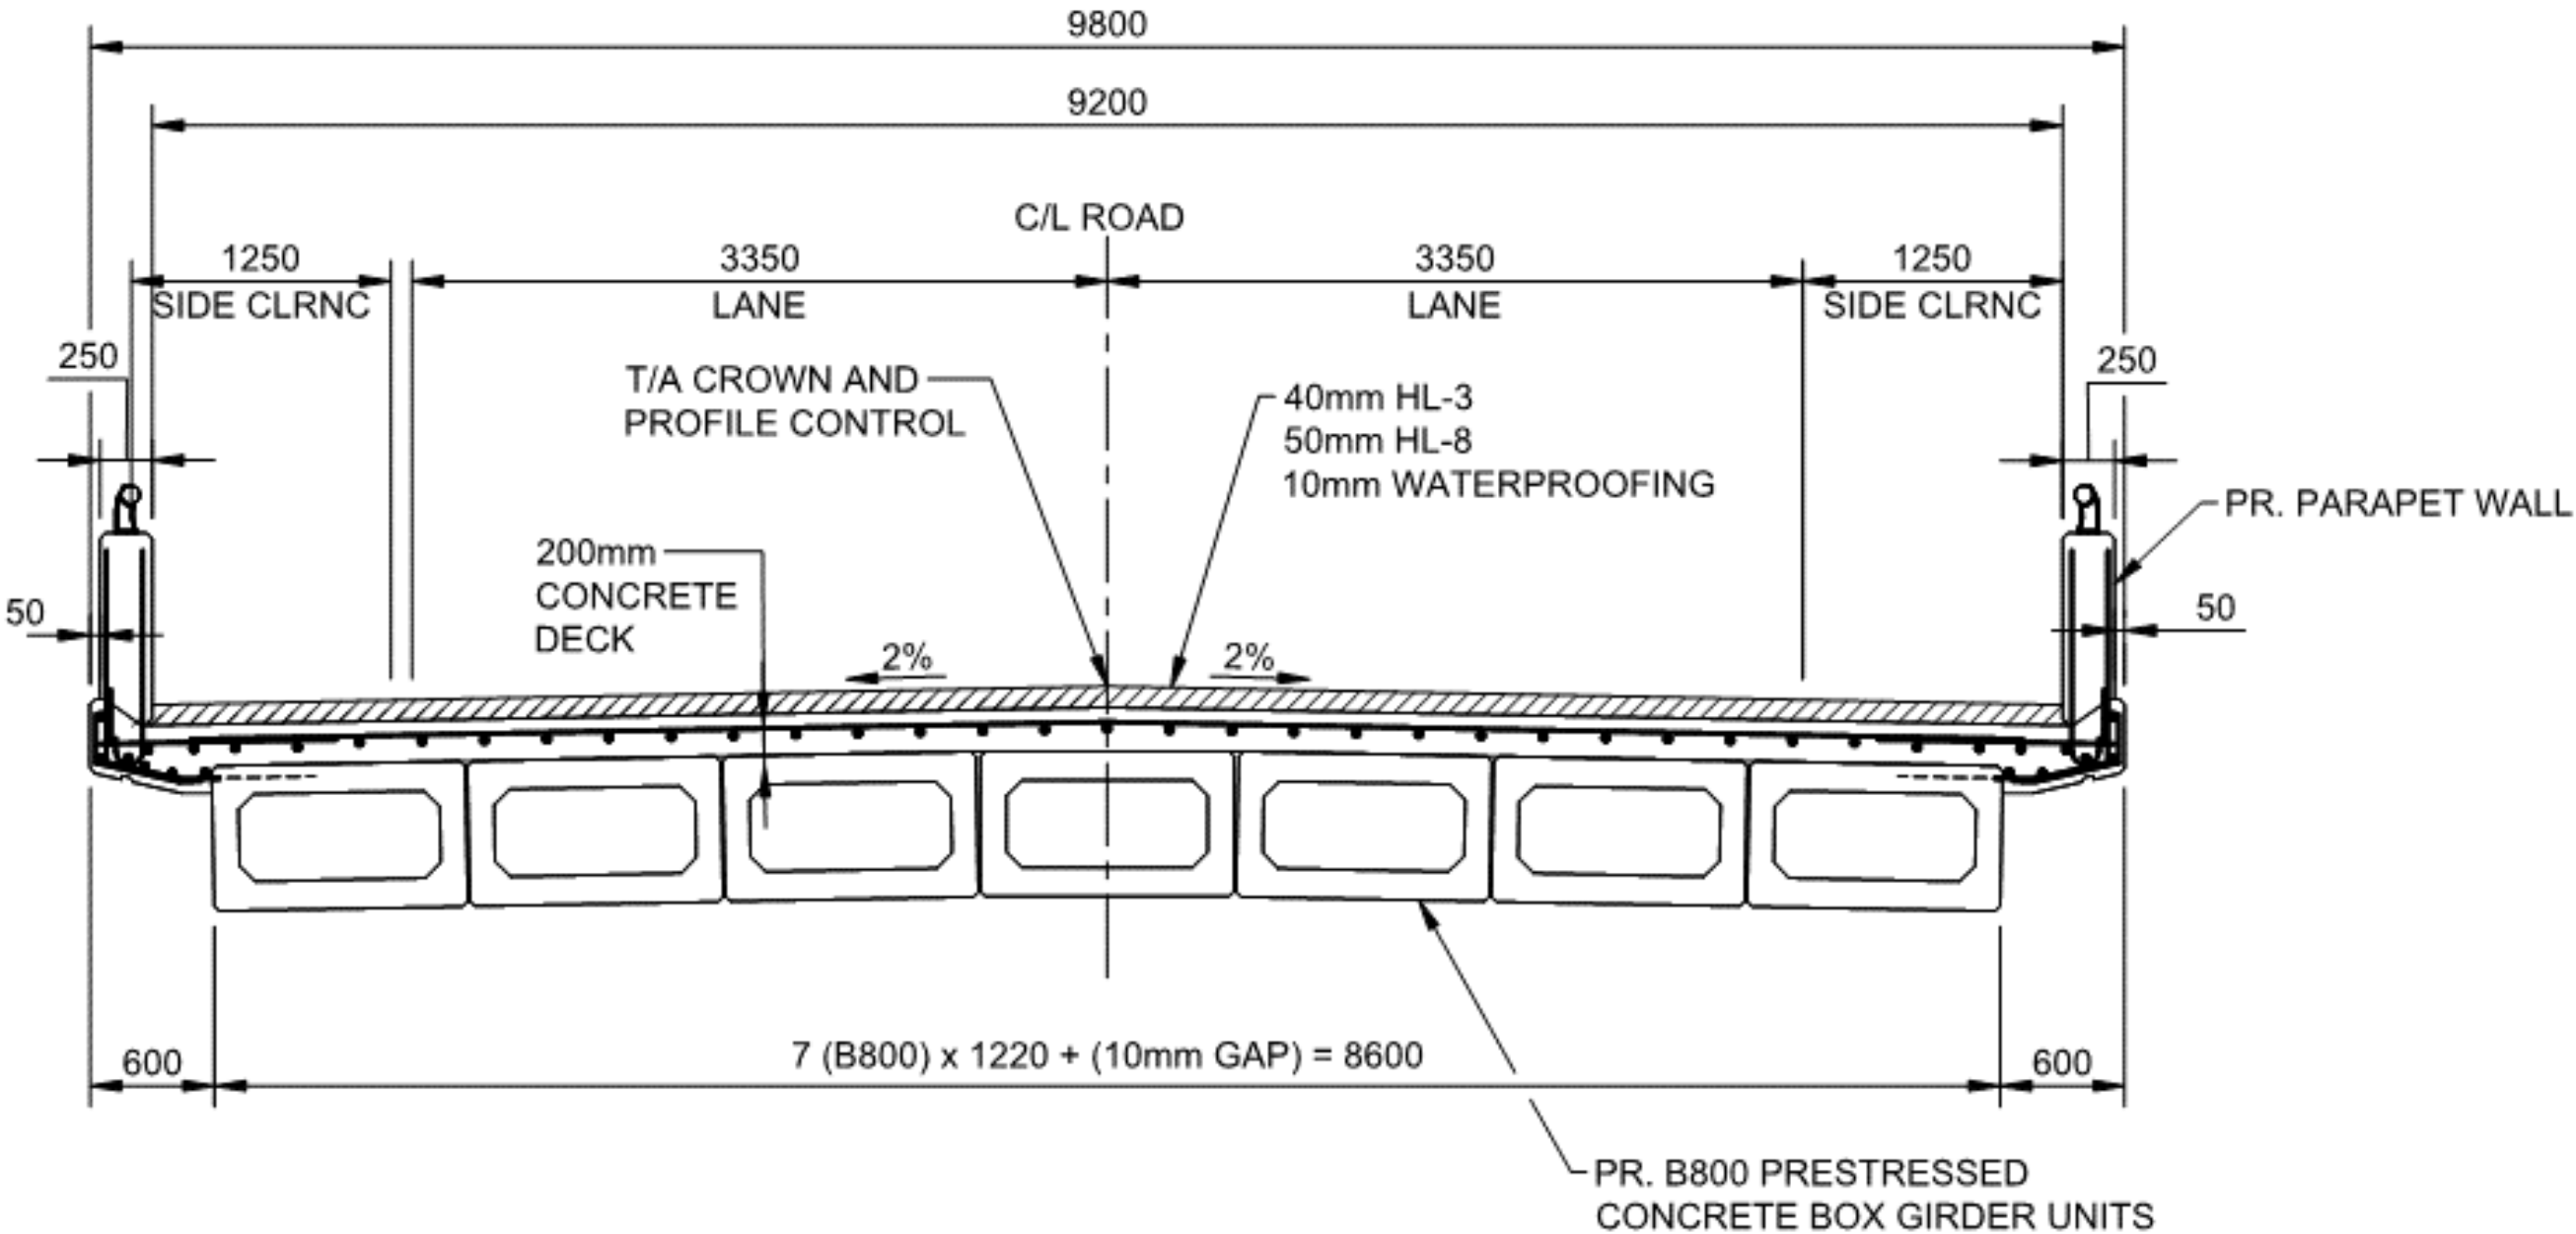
Cross-Section View of Conceptual Design, Bridge 33-P
